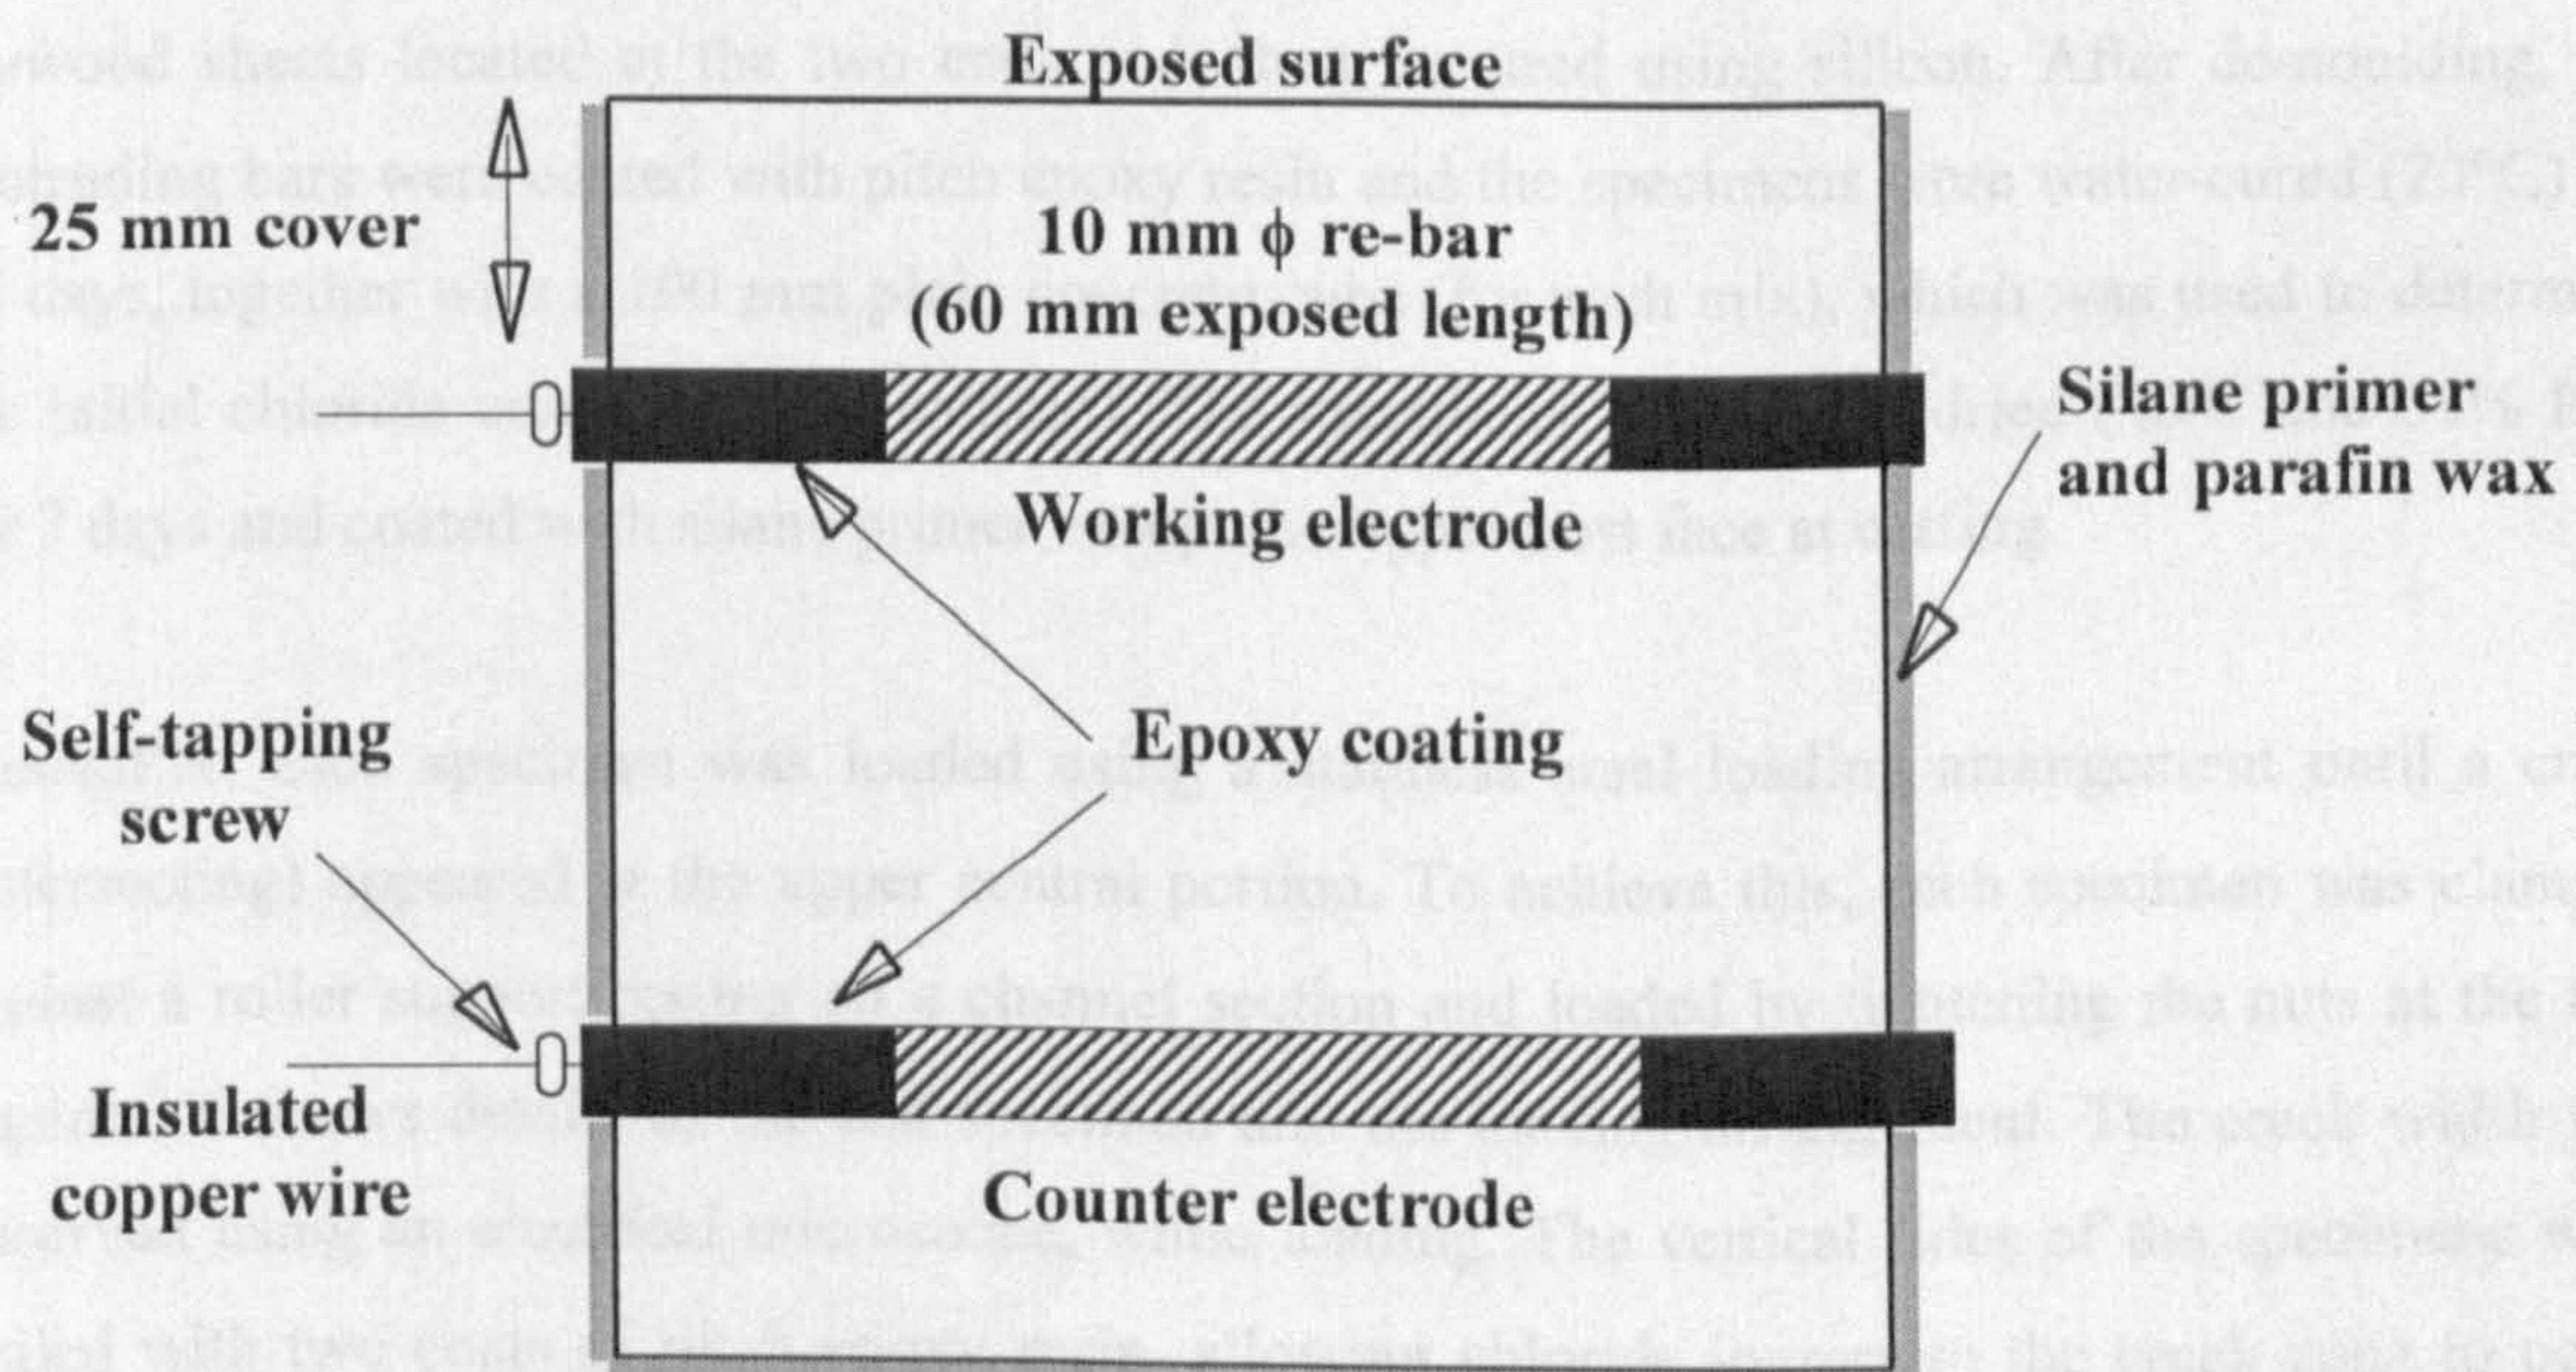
Schematic cross section of a 100 mm reinforced concrete cube specimen
